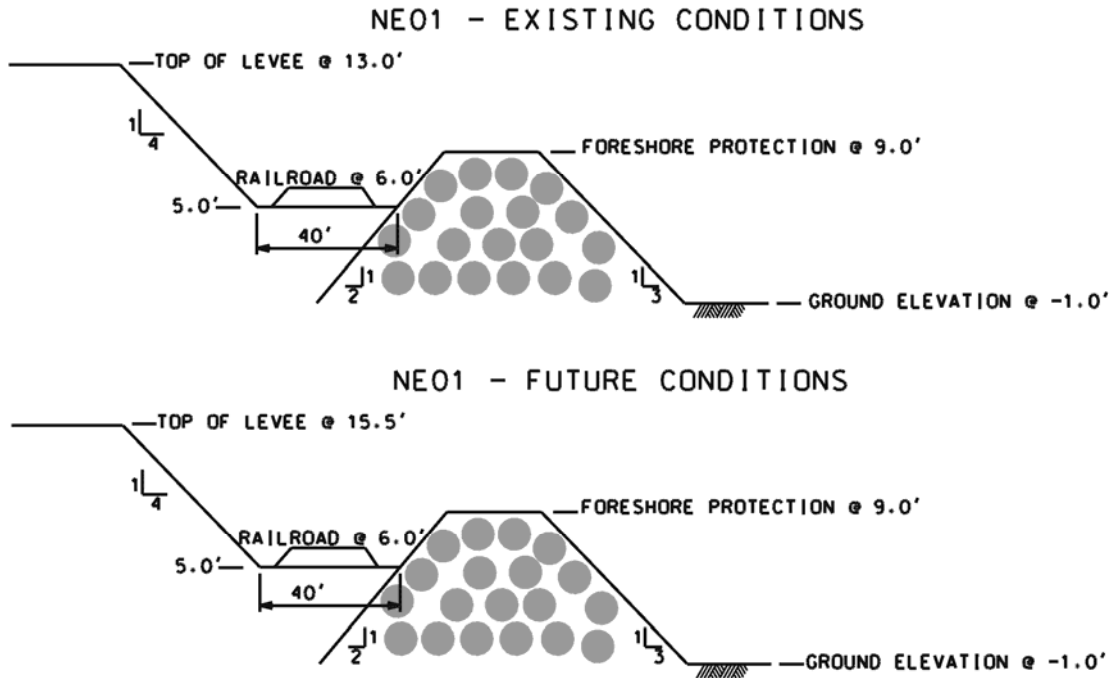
Cross-section profile for Citrus Lakefront levee (NE01) for existing (upper panel) and future conditions (lower panel).
